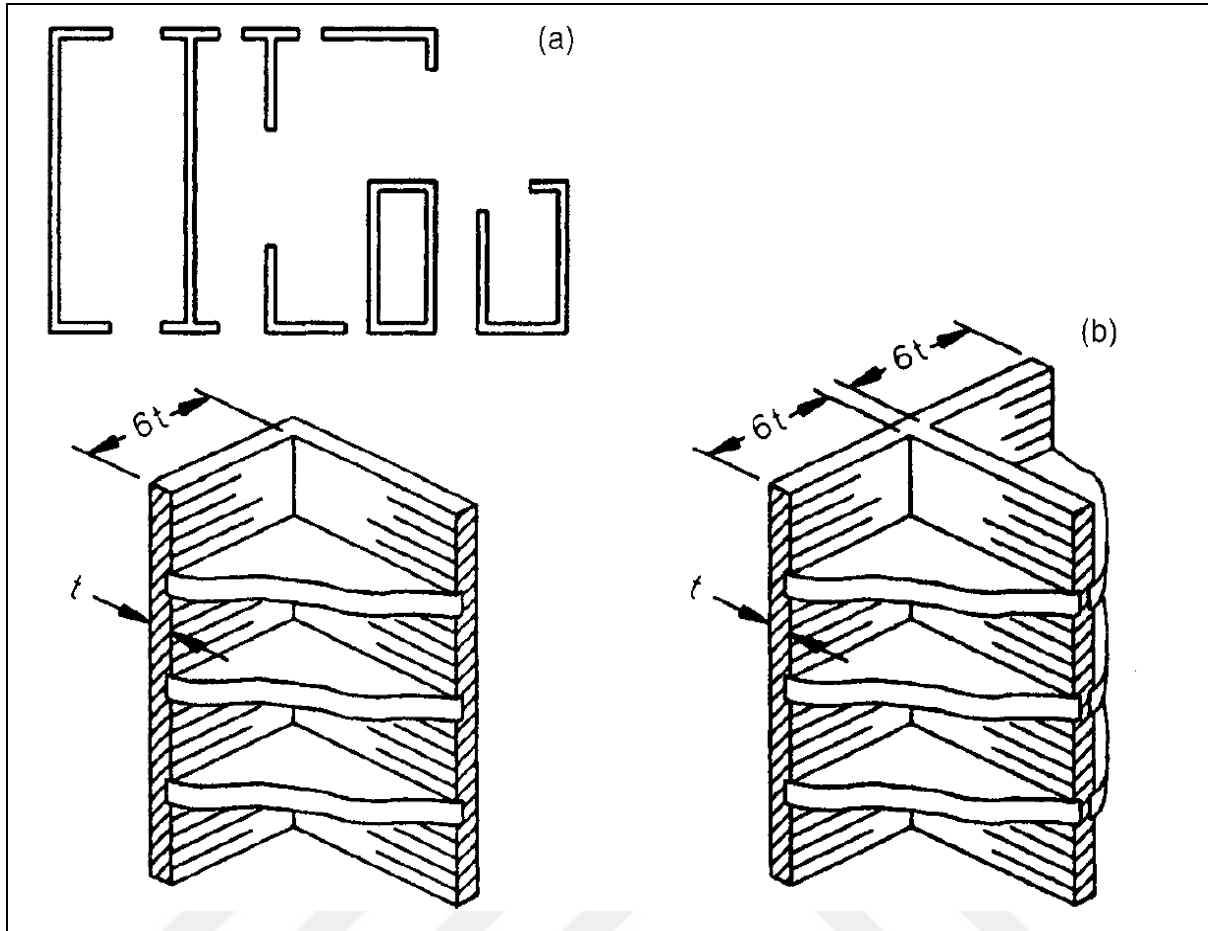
Sections of The Walls: (a) Wall Configurations Section, (b) Considering Effective Depth.
